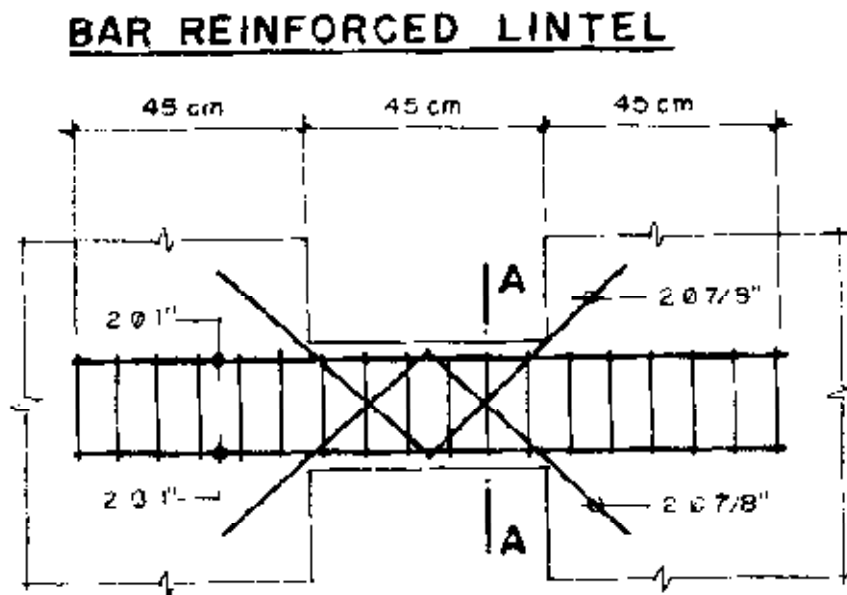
Reinforcement Layouts for Coupling Beam Specimen (Paparoni, 1972)
